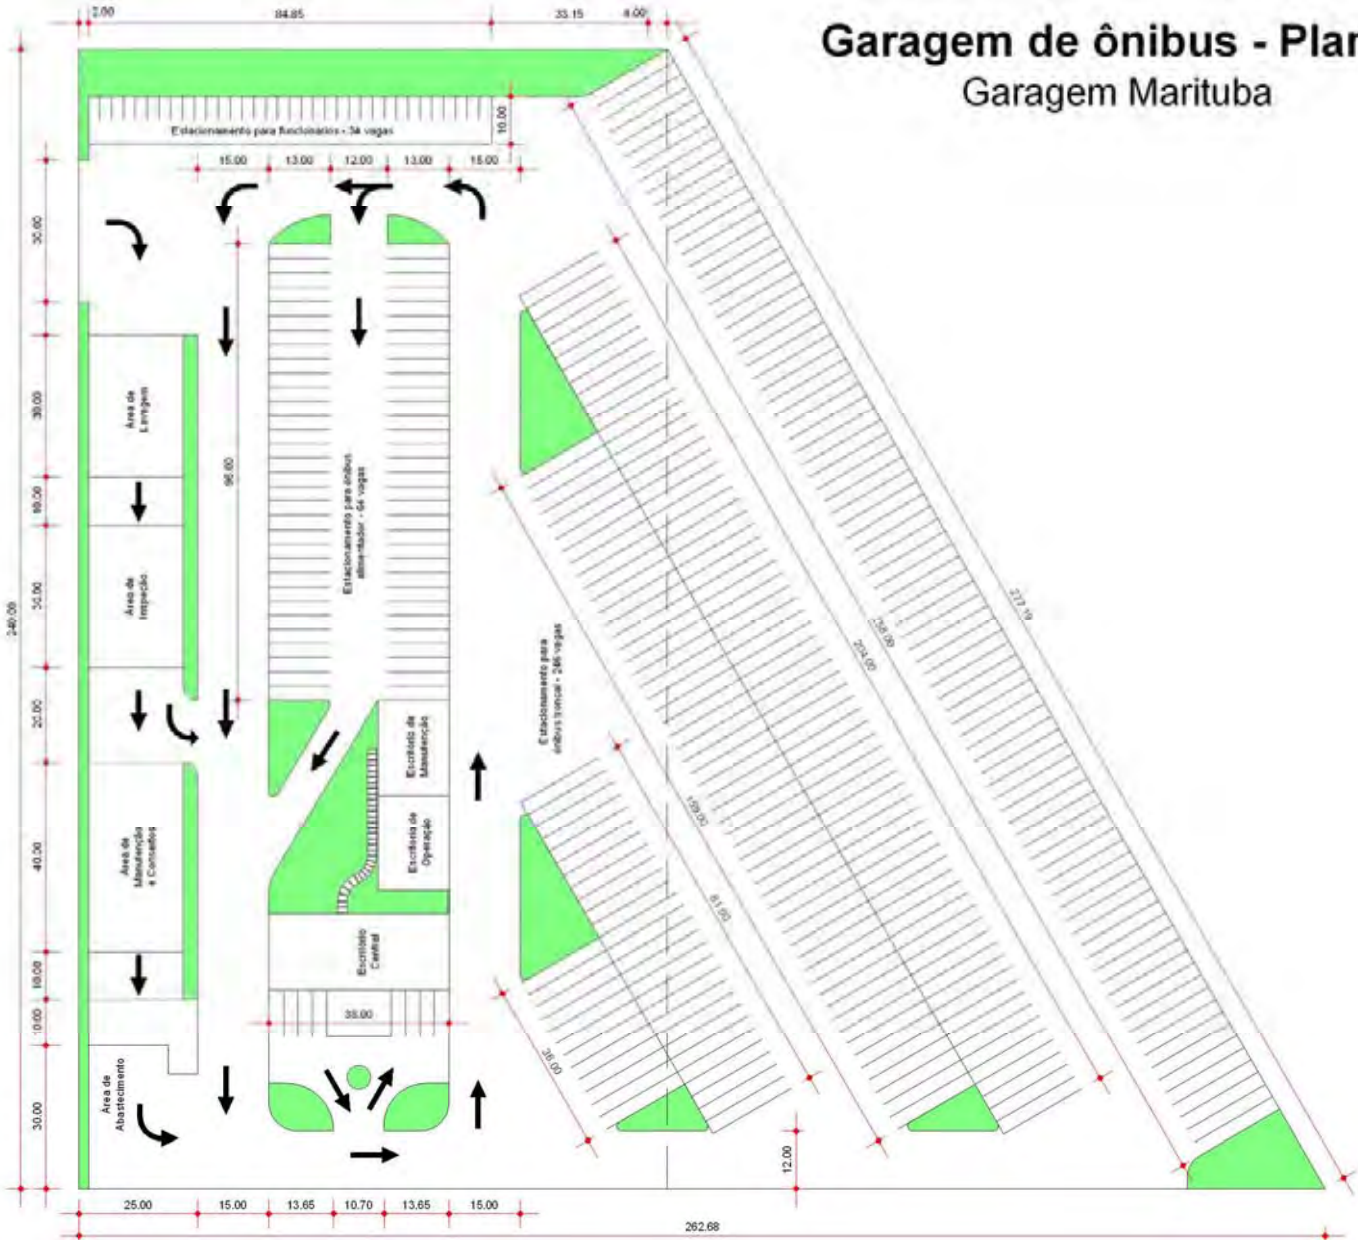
Floor Plan of Marituba Bus Depot
